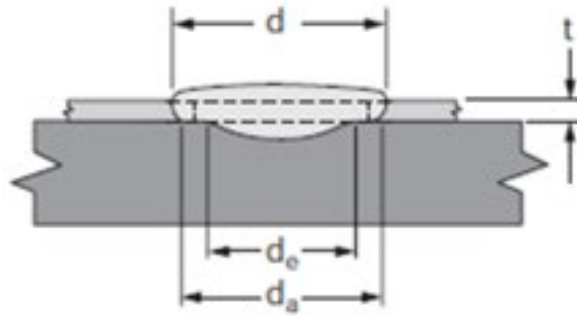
Puddle Weld Dimensions (from AISC Design Guide)
